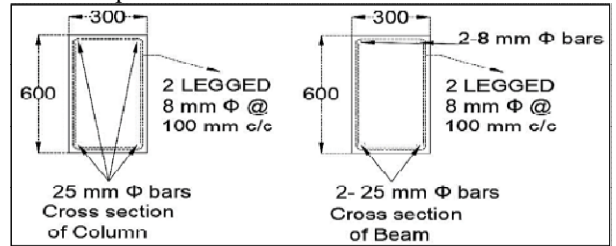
Cross Section & Reinforcement details of RC element of frame
